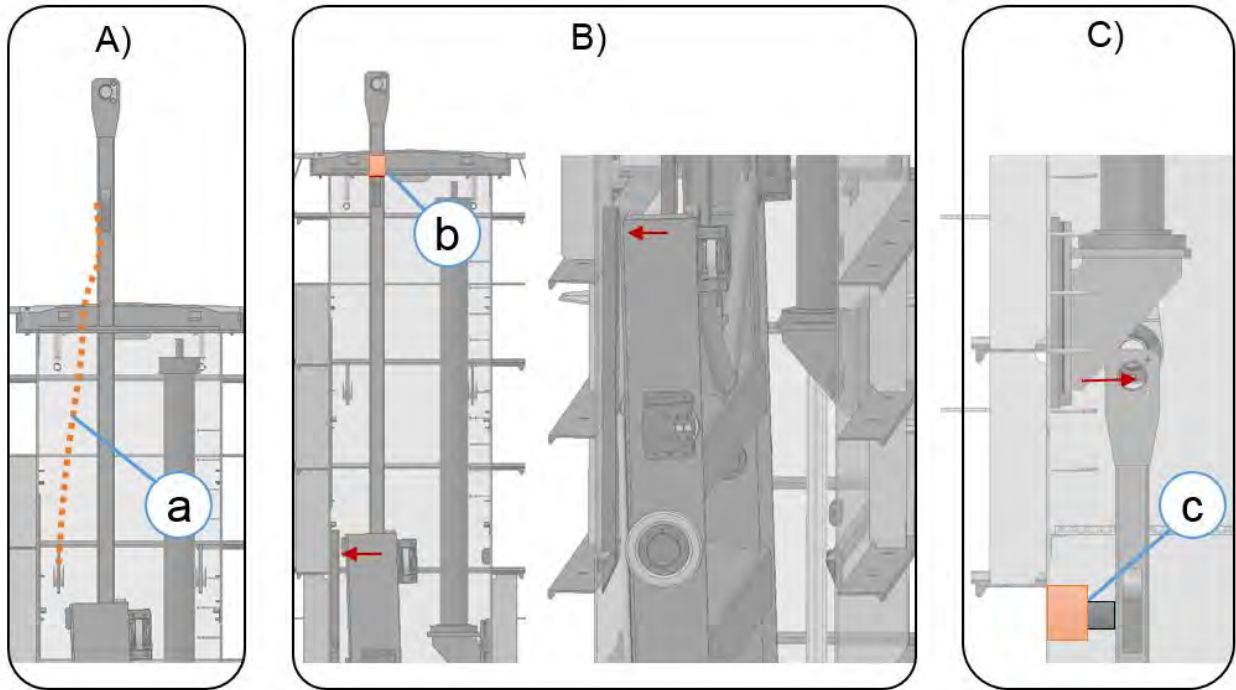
presentation of filling valves and auxiliary construction for installation
